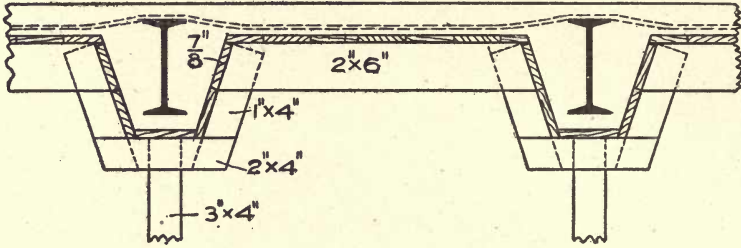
Forms for Reinforced Concrete Slab Supported by I-beams.
